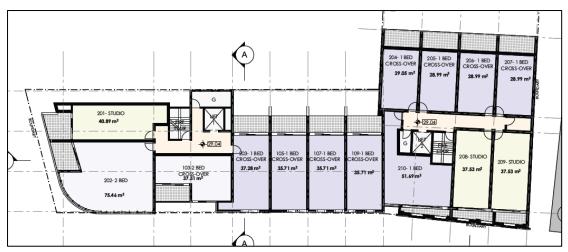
Proposed Level 2 plan. (Source: PTI Architecture Pty Ltd)
